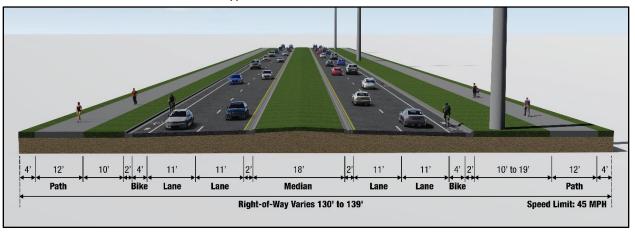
Preferred Alternative Typical Section, Partin Settlement Road to Old Canoe Creek Road
